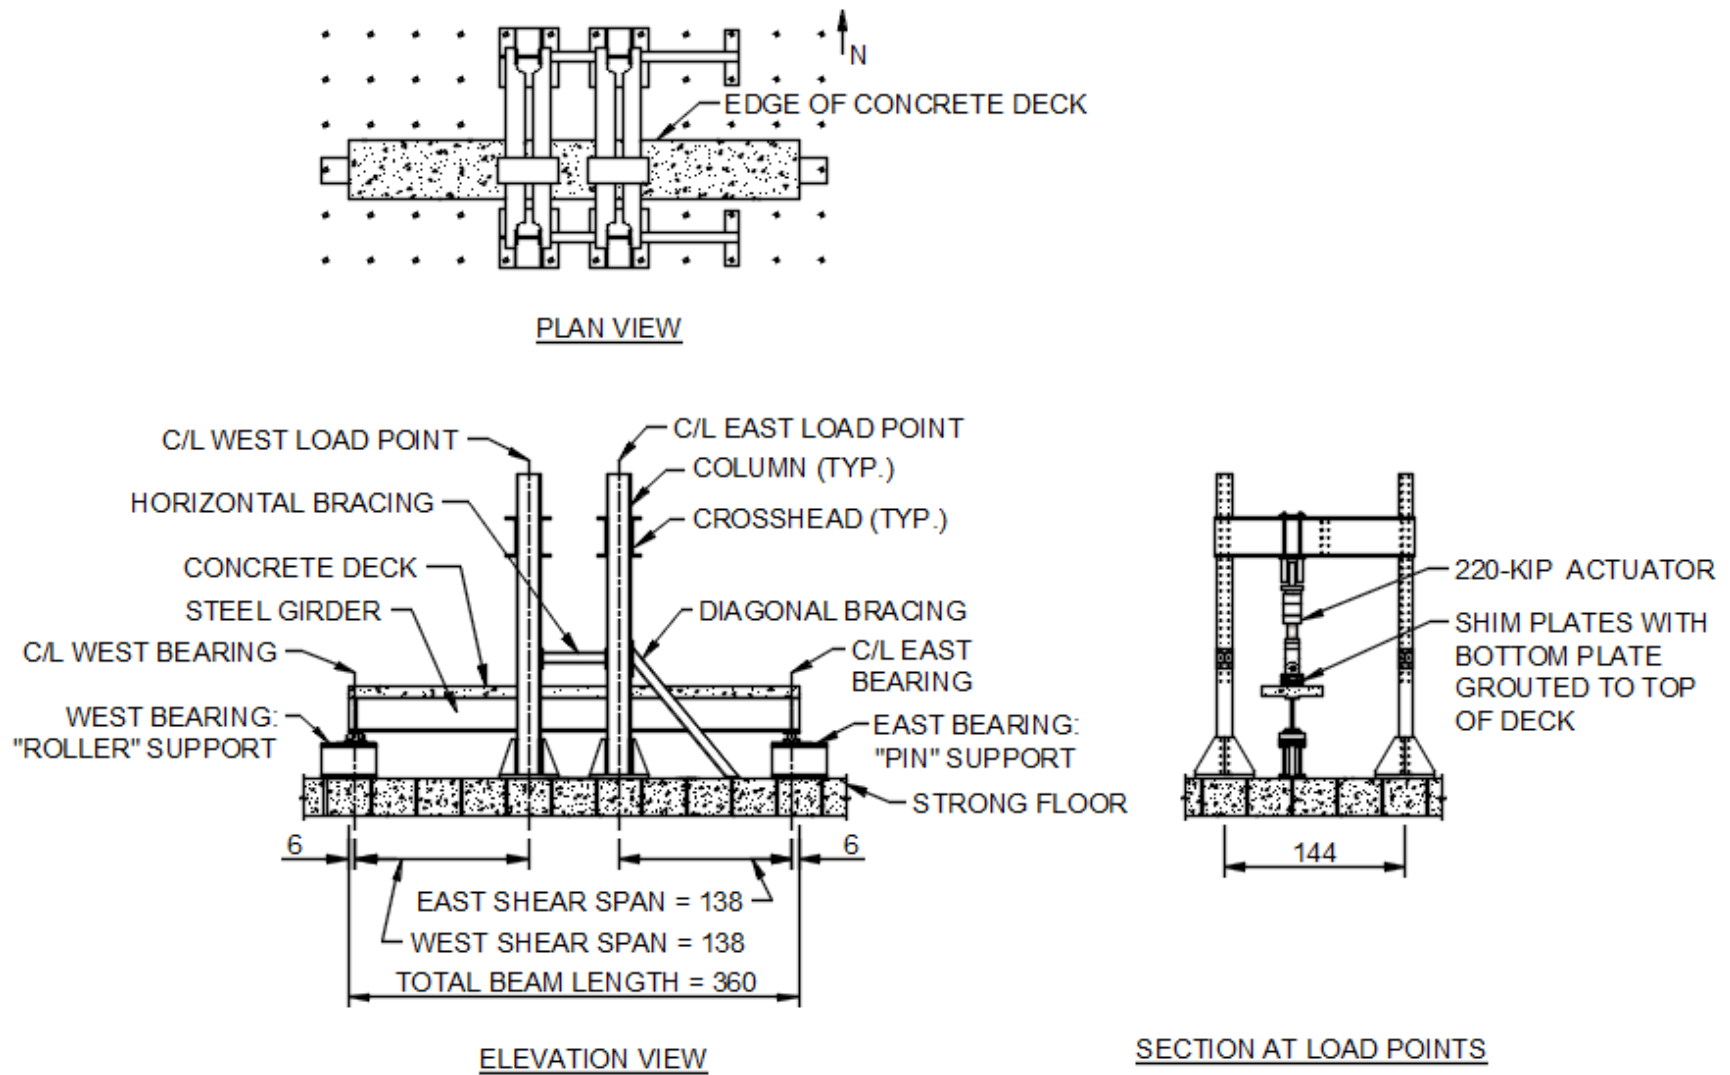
Schematic. Plan and elevation views for small-scale static test specimens.
